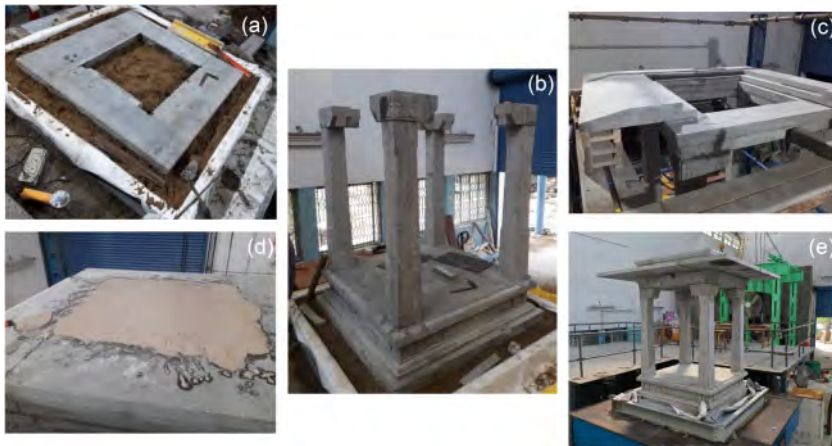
Construction sequence of the mandapa on the shake table: (a) assembly of stone blocks of the plinth over a graded sand bed; (b) placement of pillars and corbels on the completed plinth; (c) assembly of sunshades over the beams; (d) provision of lime concrete weathering course over the stone roof slabs; (e) completed model with parapet wall as counterweight for the cantilevered sunshades.
